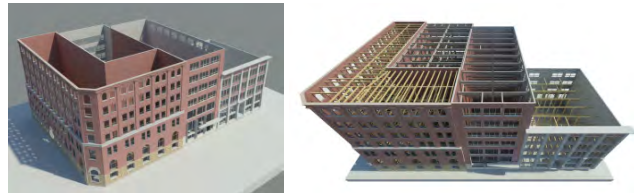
(left) Completed envelopes and (right) structural framing of the four buildings.
